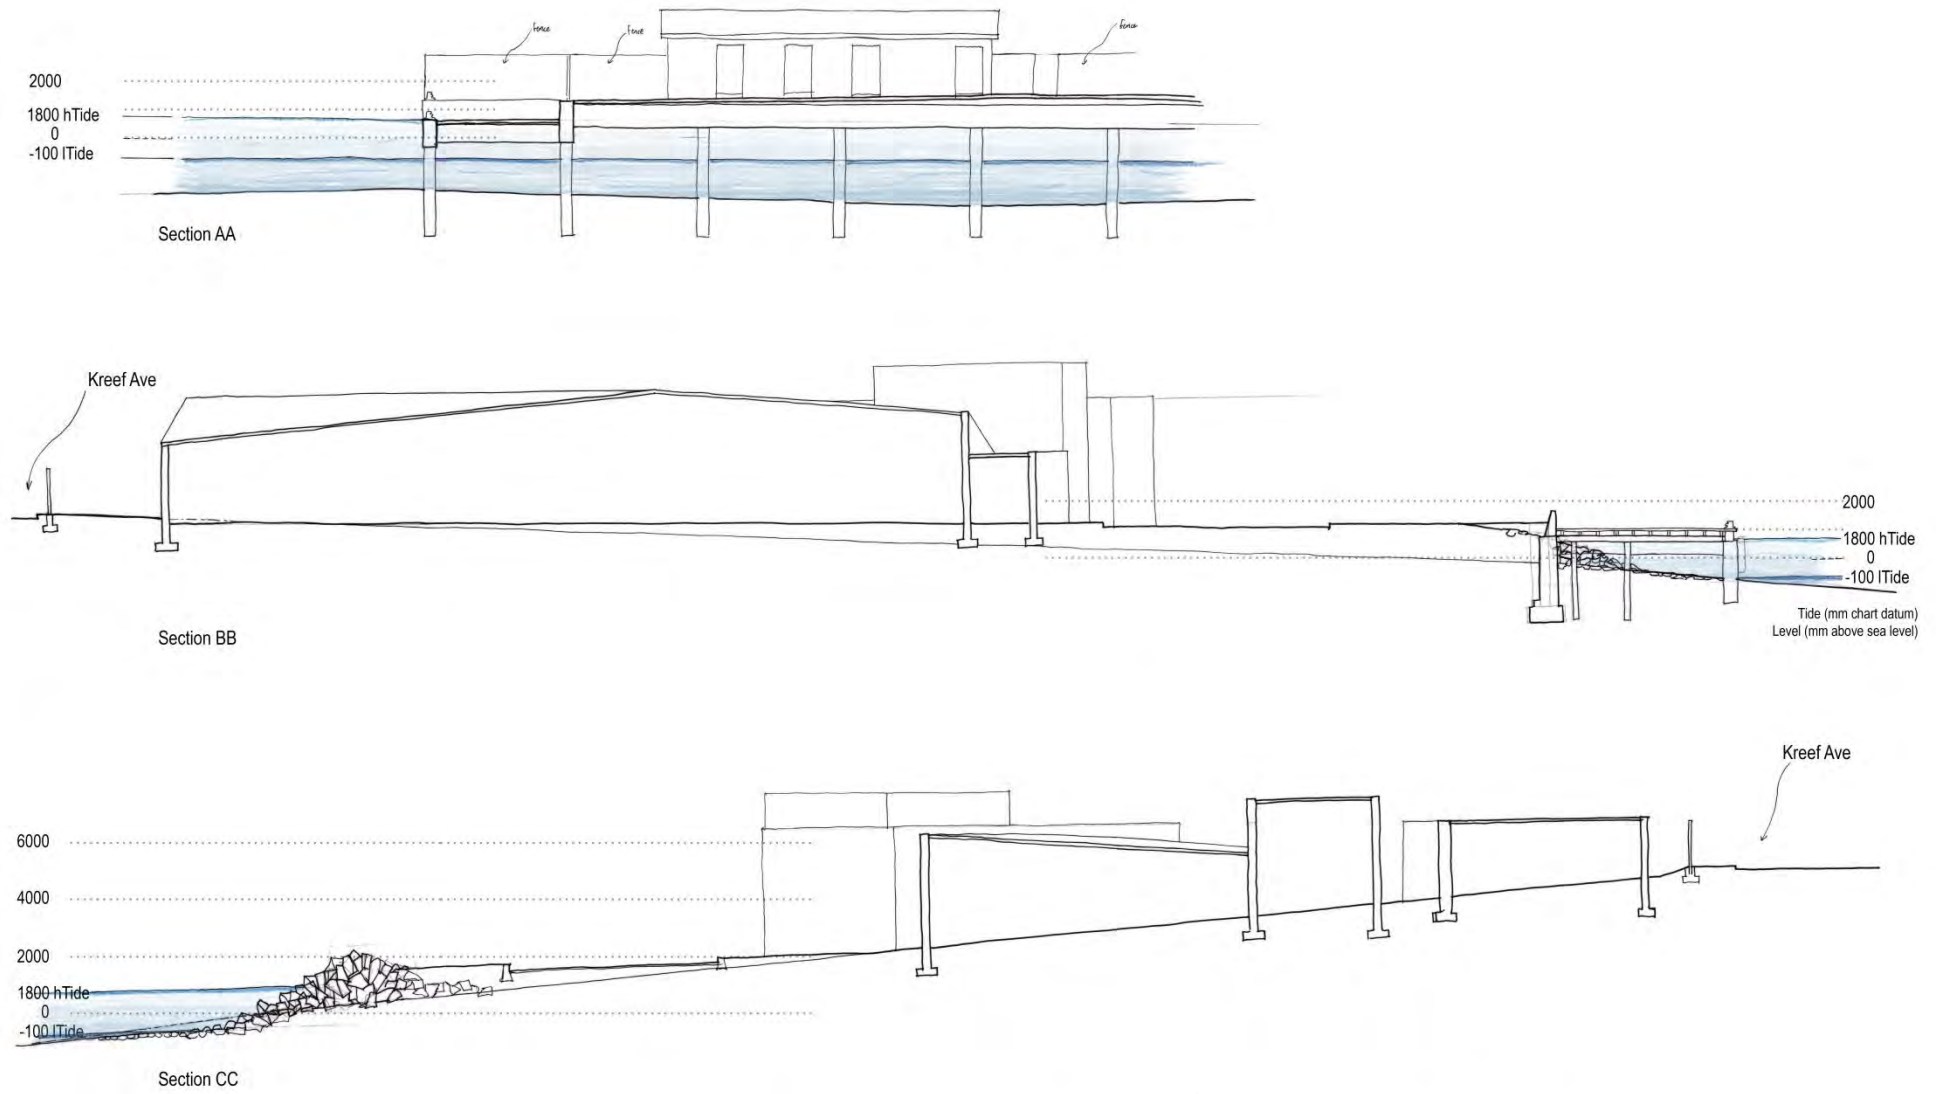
Sections through existing site at the old quay. (Top: Section AA through old quay, Middle: Section BB, Bottom: Section CC) (Author, 2013)
